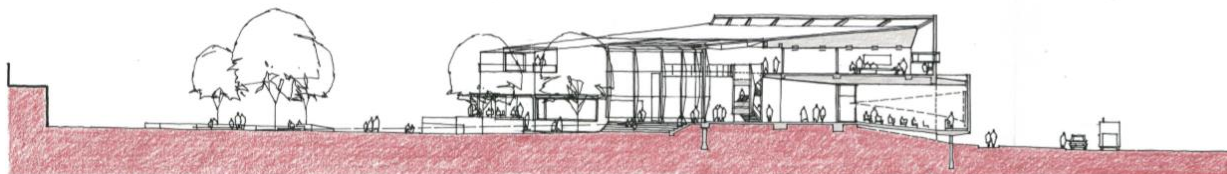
Architectural sketch of the Ballarat Secondary College building, 1998. Section through the building. (Source: Cox Architecture)
